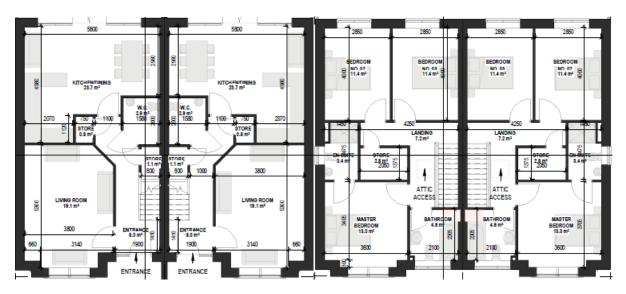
Typical ground floor plan of House Types 2.1-2.2 (left) and typical first floor plan House Types 2.1-2.2 (r).
